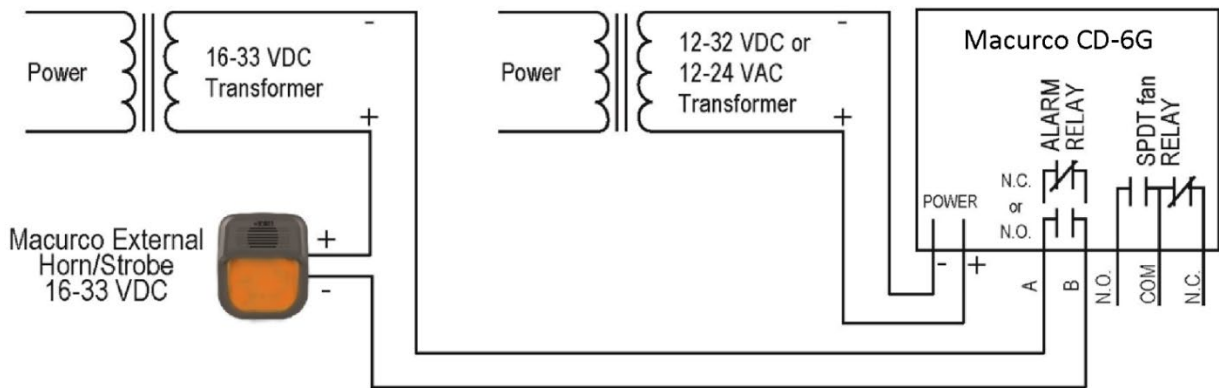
CD-6G Horn & Strobe Combo Wiring
